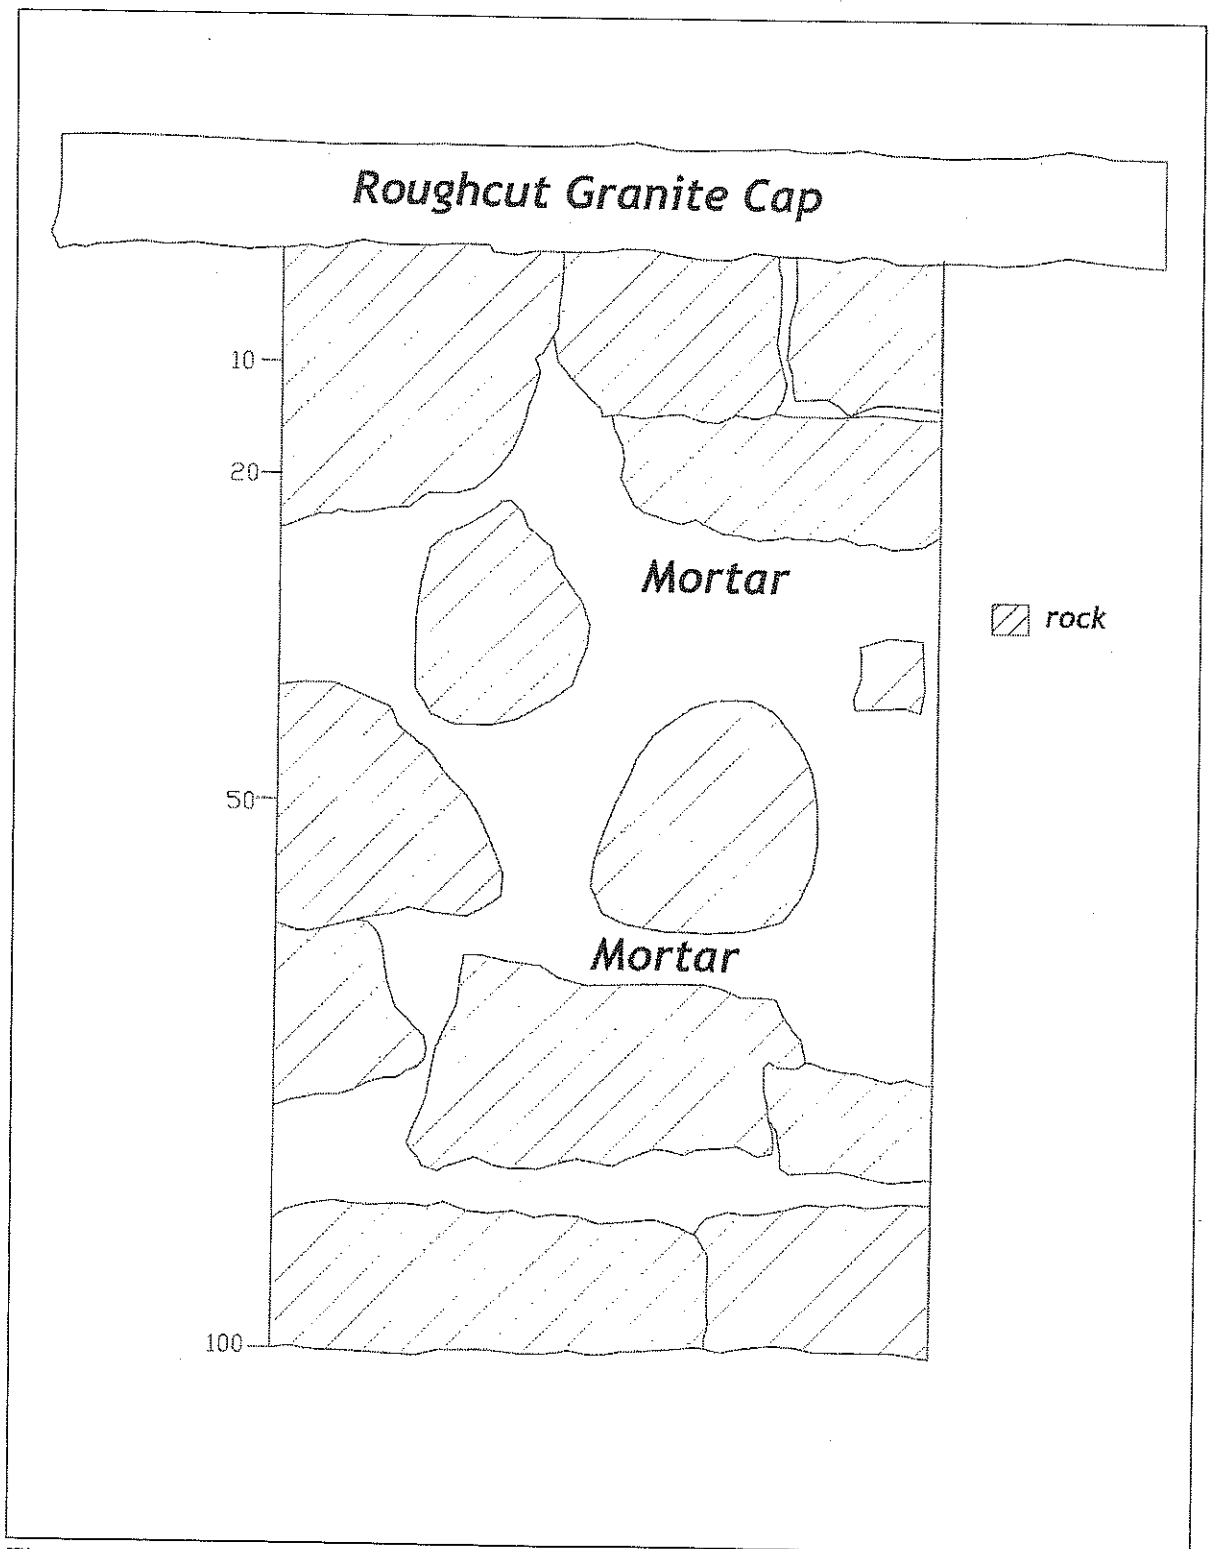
Profile drawing of Feature 1, north wall, 0-100 cmbs, EU 1 and EU 2, Stonehurst project area, Waltham, Massachusetts.
